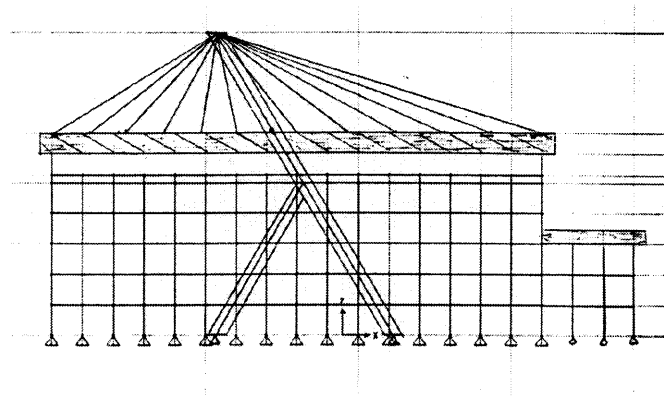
Elevation View of the New CEE Building Drawn to Scale
